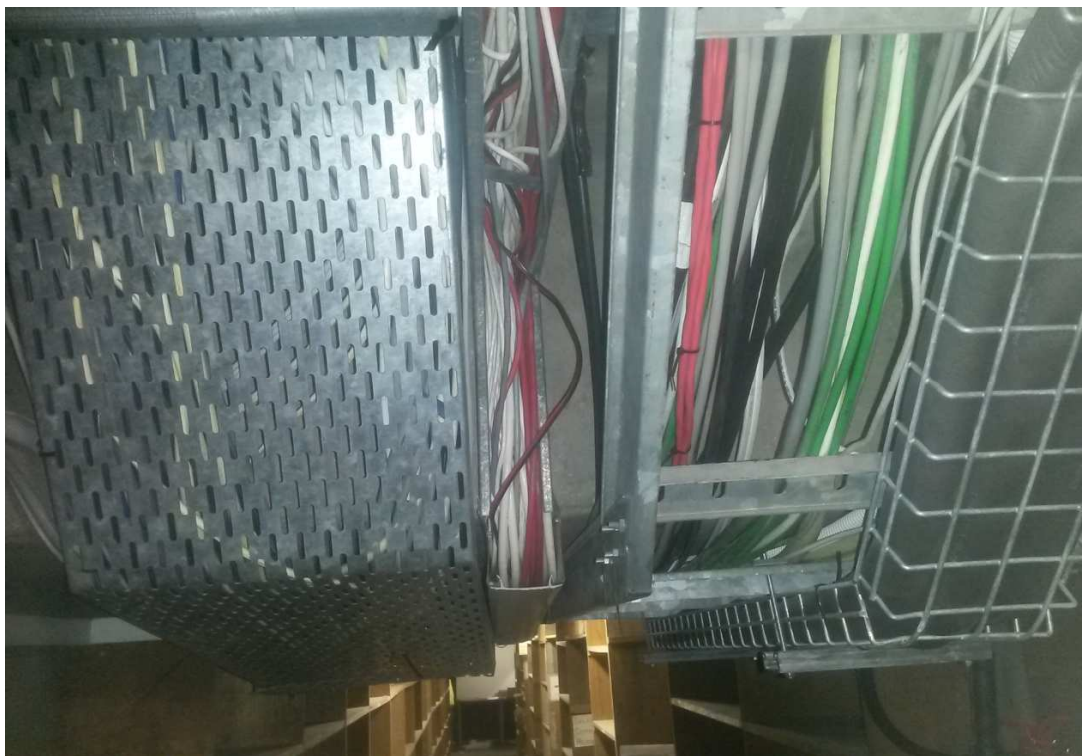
Basement viewed from Passage 3 doorway - Cable trays with electrical and mechanical services
